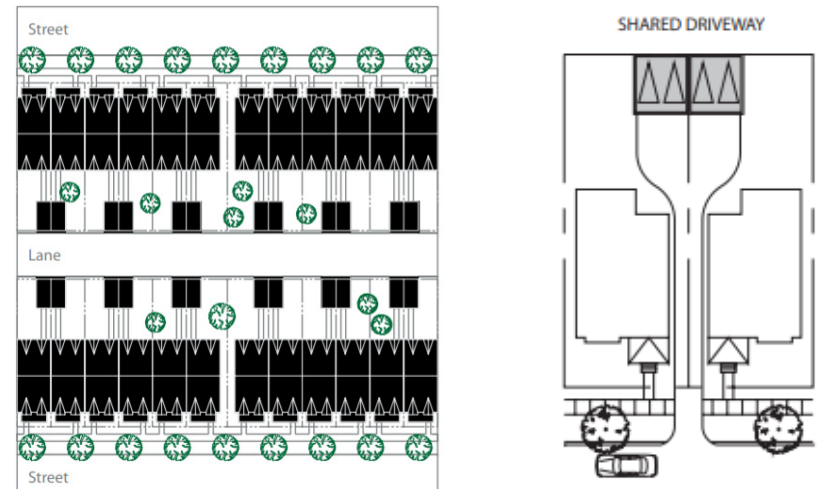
Example of Preferred Townhouse Site Plan Organization (RUDG)
